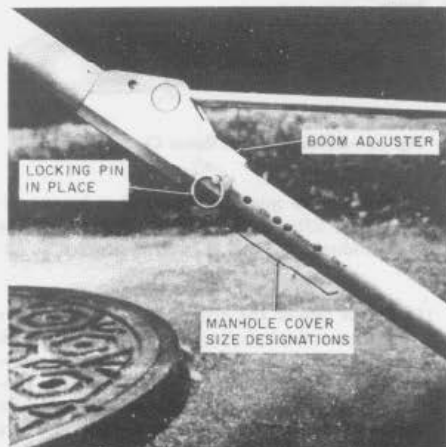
Boom Adjuster Locked in Position to Remove Manhole Cover by Hook Holes
